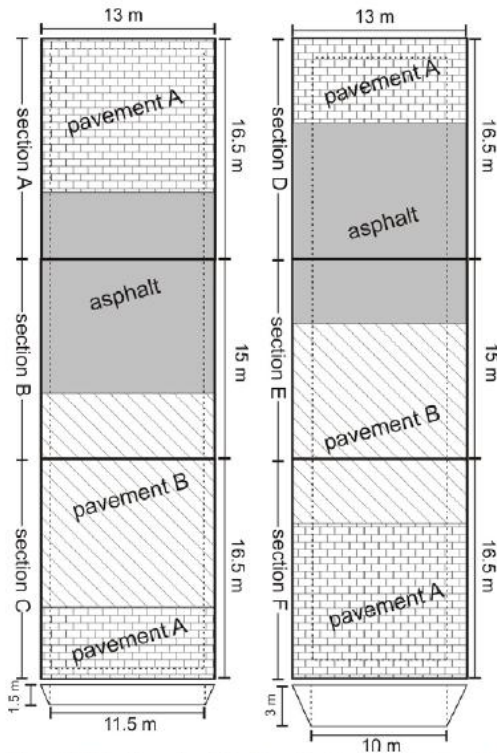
The dimension of the Frankfurt test site. Section A,B and C have natural soil conditions, Section D,E and F are sealed
